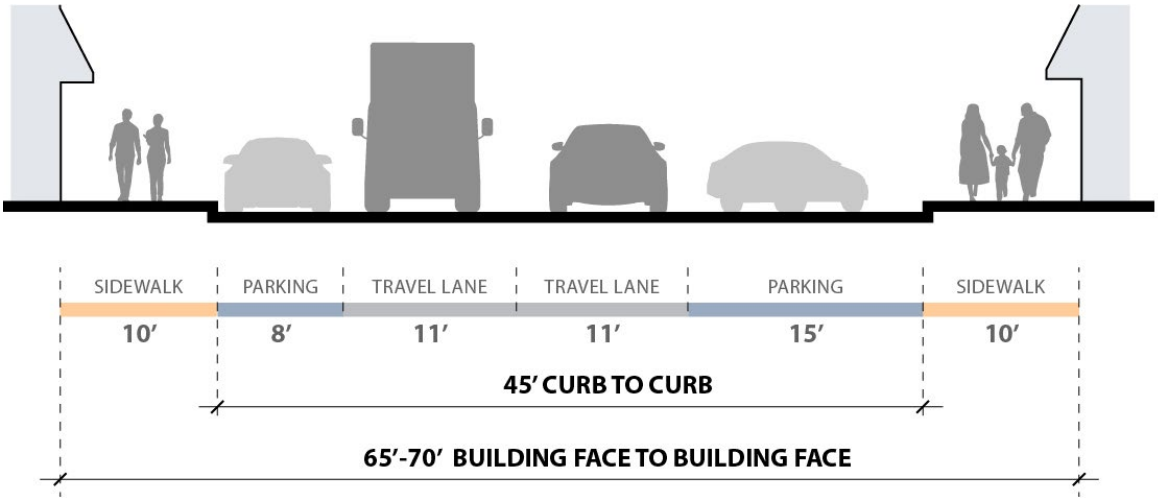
EXISTING STREET CONDITION: MID-LAUREL STREET, 1000 BLOCK (LOOKING NORTH)
